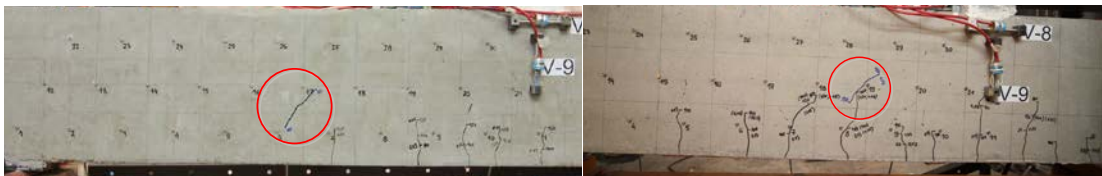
The first shear crack in a) OPC-2 and b) HVFAC-2 beams
